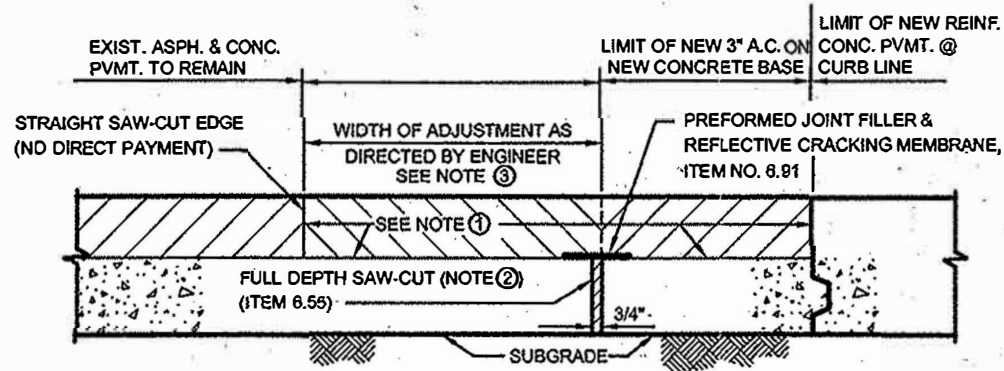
DETAILS FOR SLAB JOINT/MANHOLE ARRANGEMENTS
